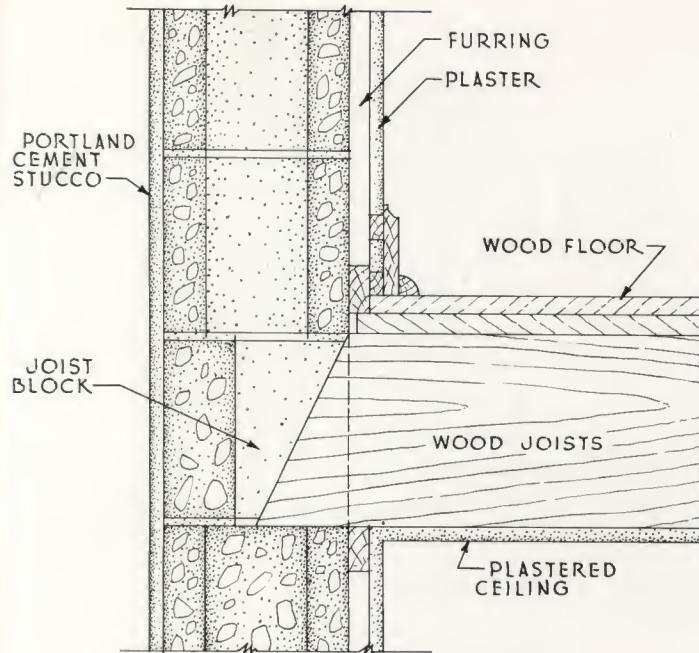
Wood joist—wood floor finish—8-in. concrete masonry wall—portland cement stucco.
